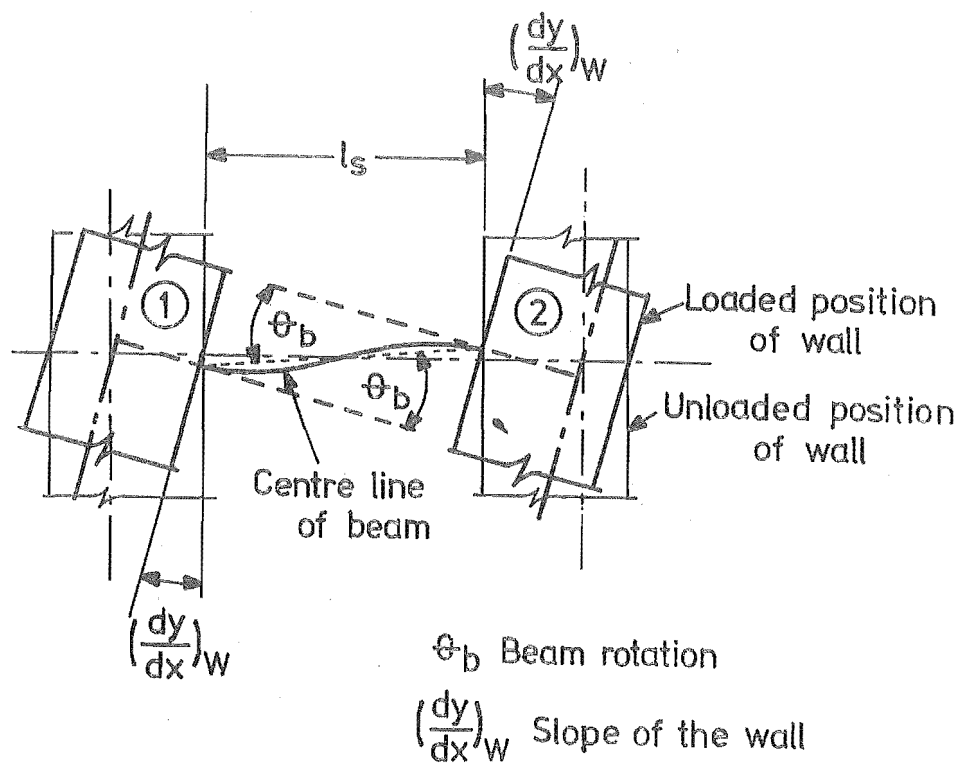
ROTATIONS OF A COUPLING BEAM
